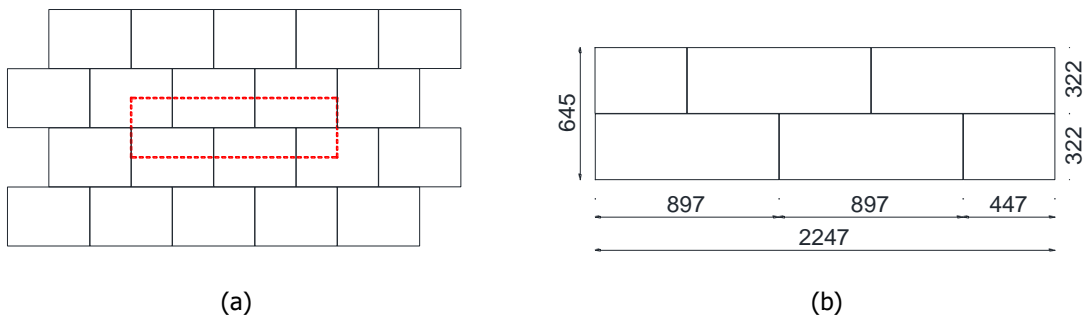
In-plane bending test (IP): (a) tested portion; (b) dimensions of the specimen.
